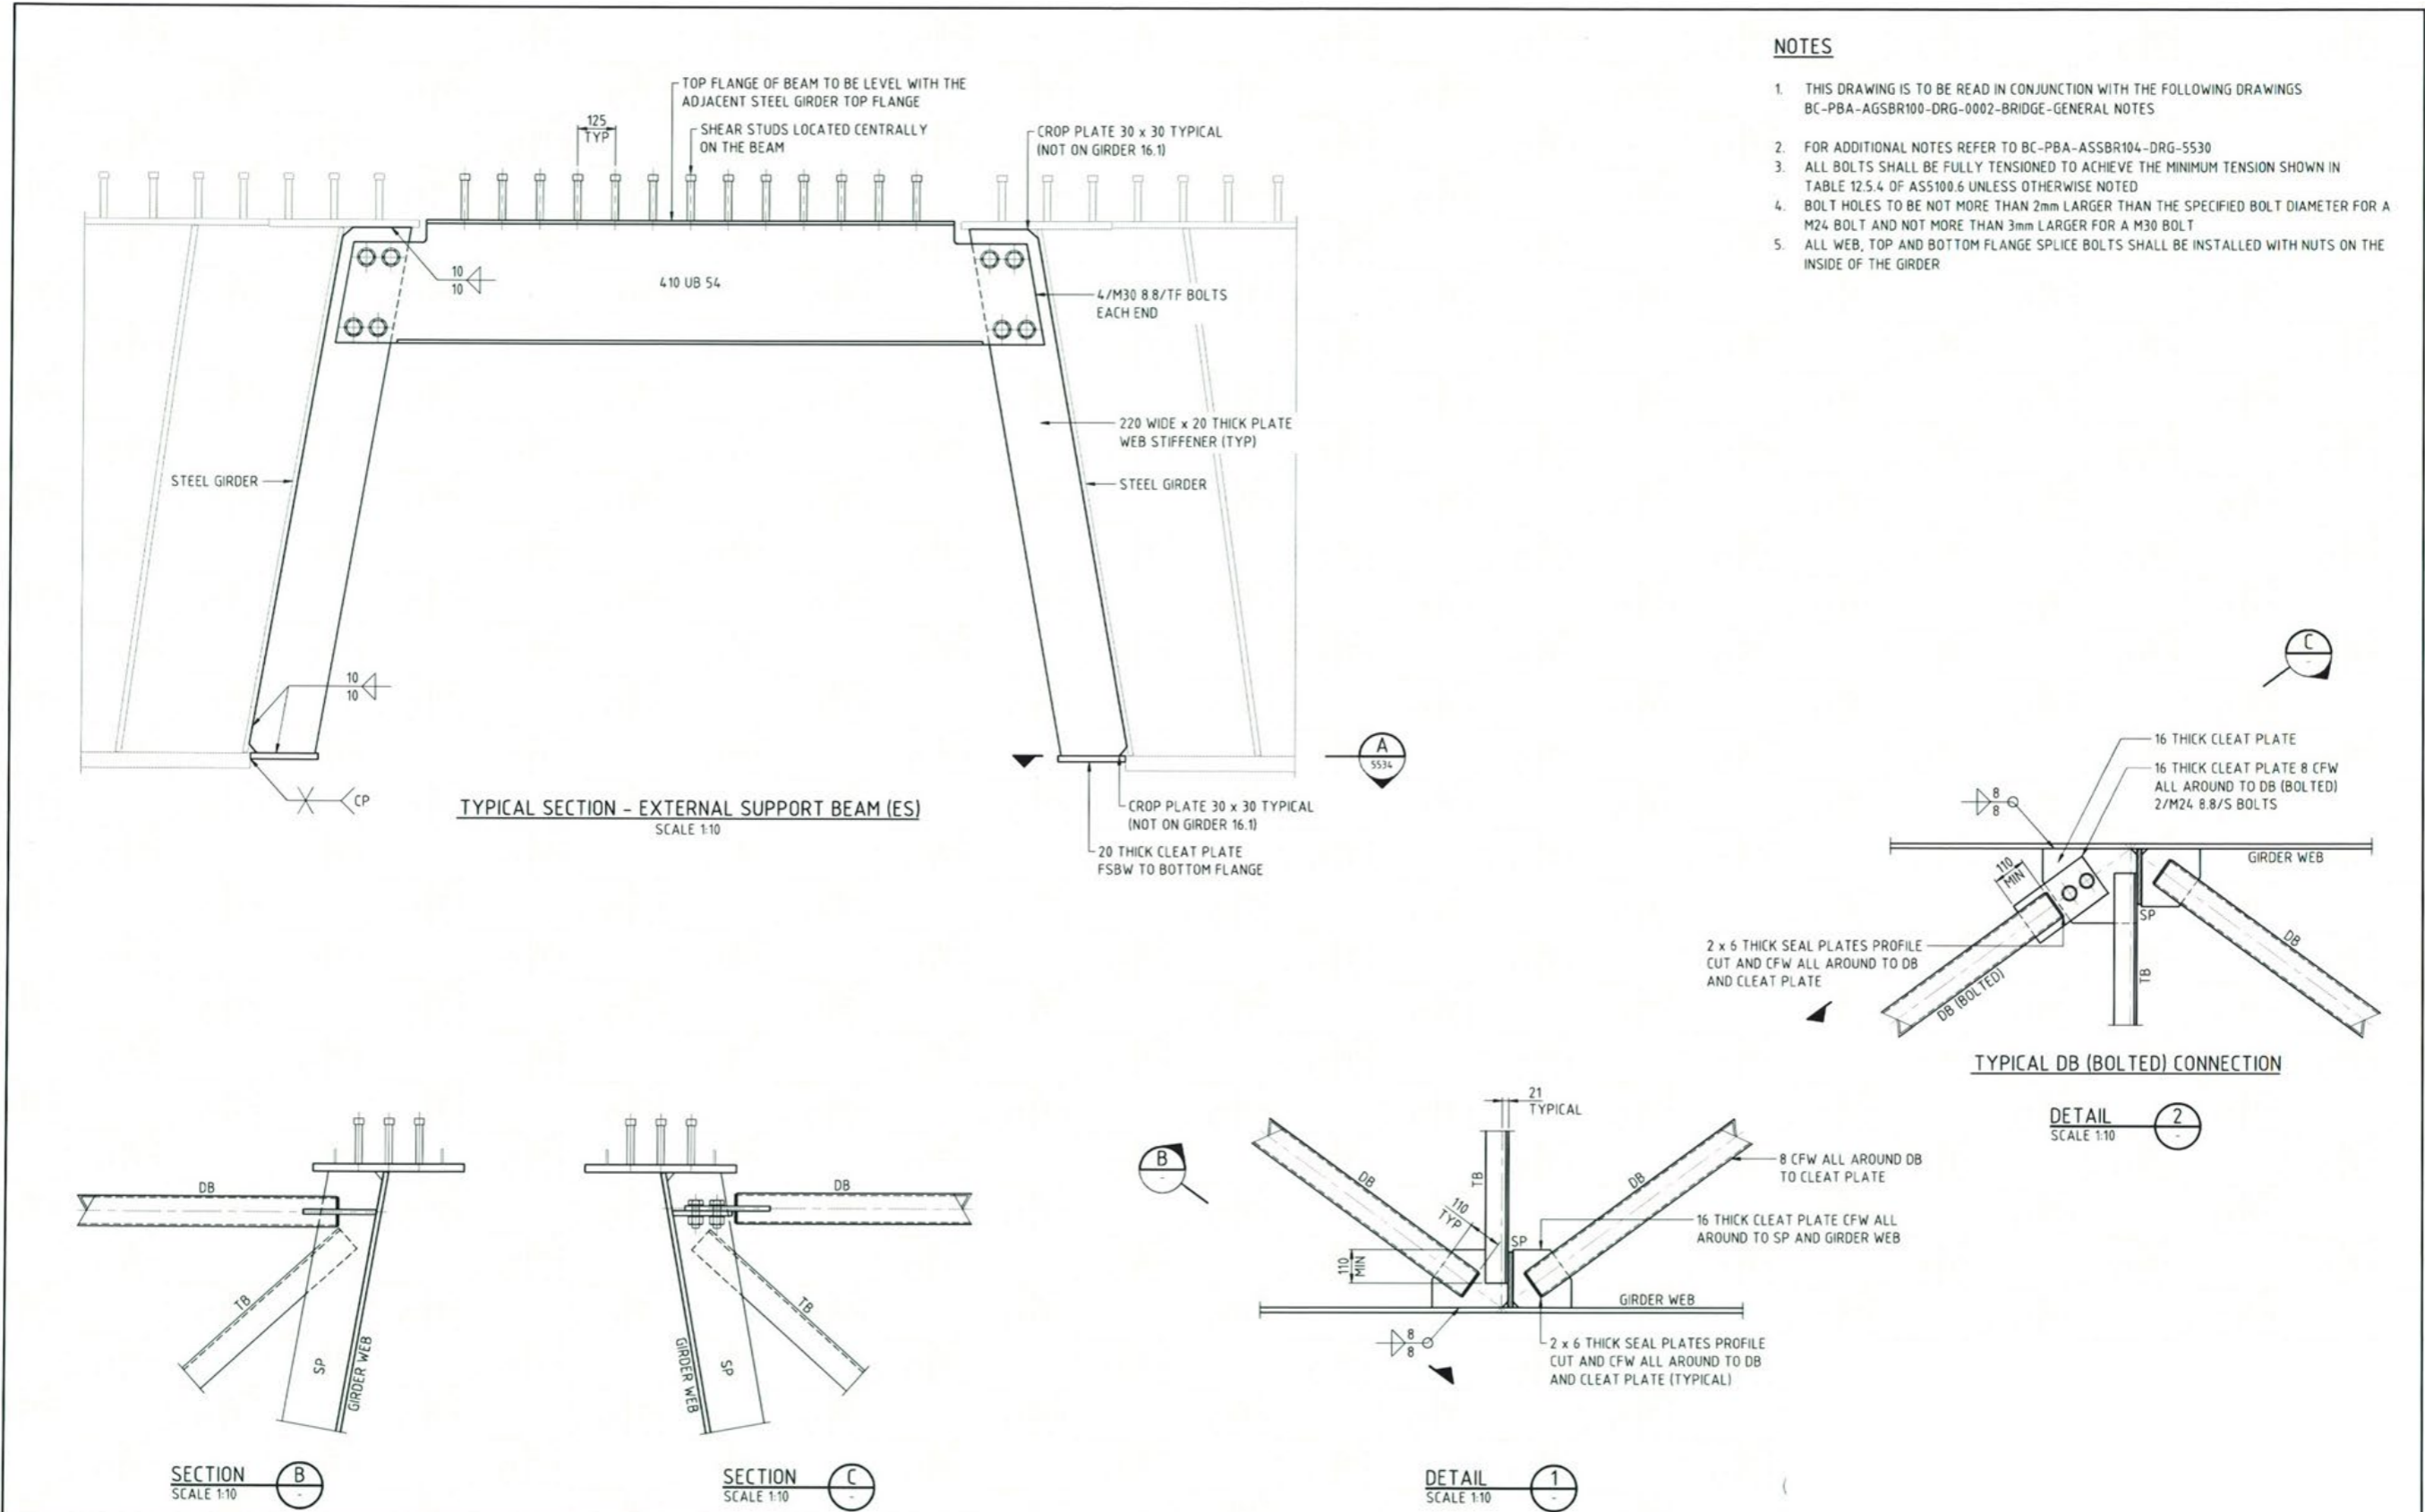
(e) - Example steel box girder bridge drawings - steel girder details - Sheet 3
